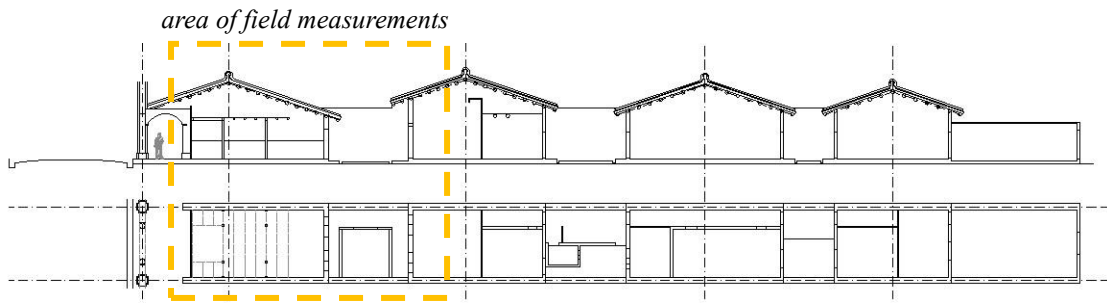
Floor plan and longitudinal section of case study shophouse no.88. (Source: Measured and illustration by author, 2007-08)
